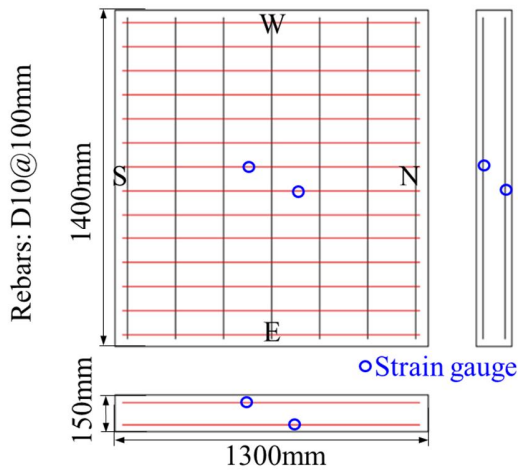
shows the geometry and the arrangement of reinforcing bars in the test specimen. It also shows the locations of strain gauges attached to measure the strain on the main reinforcing bars. The test specimen is an RC plane member with dimensions of 150 mm in thickness, 1,300 mm in length, and 1,400 mm in depth. The material and structural properties of the test specimen are detailed in Table 1. The design of these properties was guided by the Japanese guidelines and recommendations for the seismic performance verification of critical underground RC structures in nuclear power plants (JSCE 2021).
